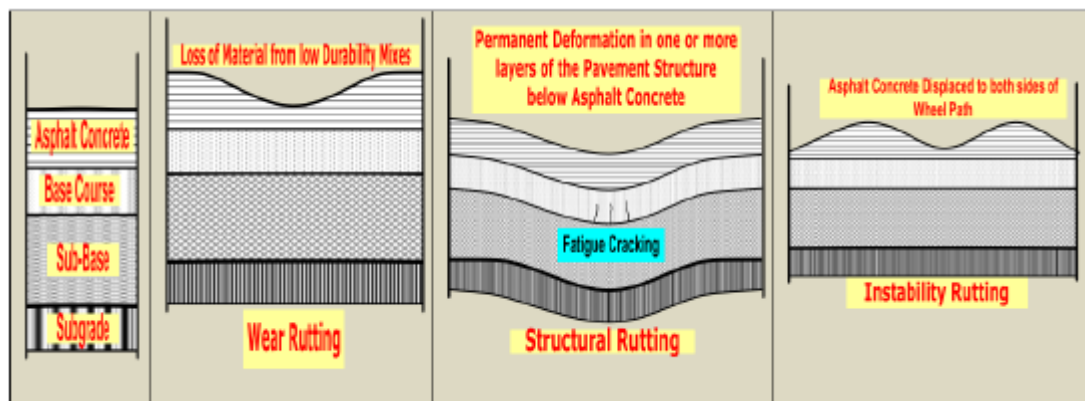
Cross section of pavement outlining failure types due to fatigue cracking and rutting (after White et al. 2002)
